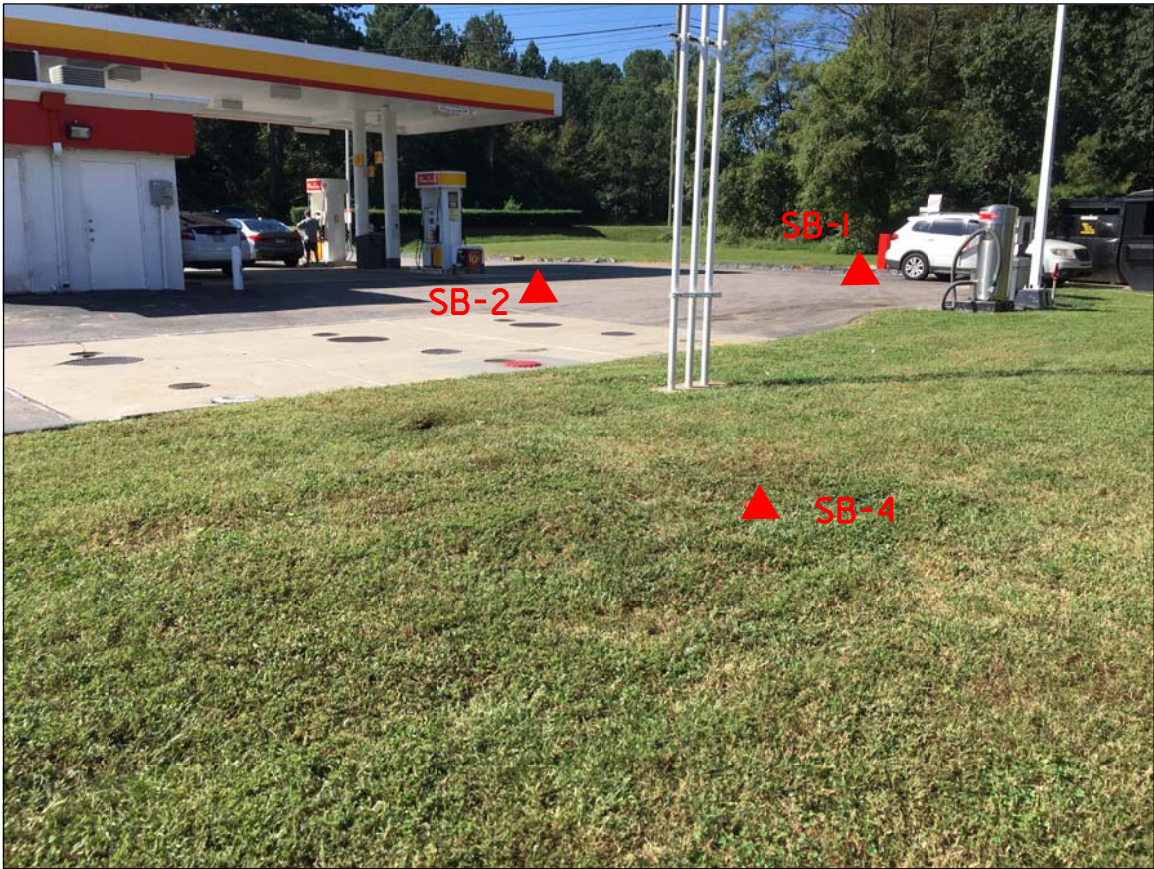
VIEW OF SOIL BORING LOOKING WEST
